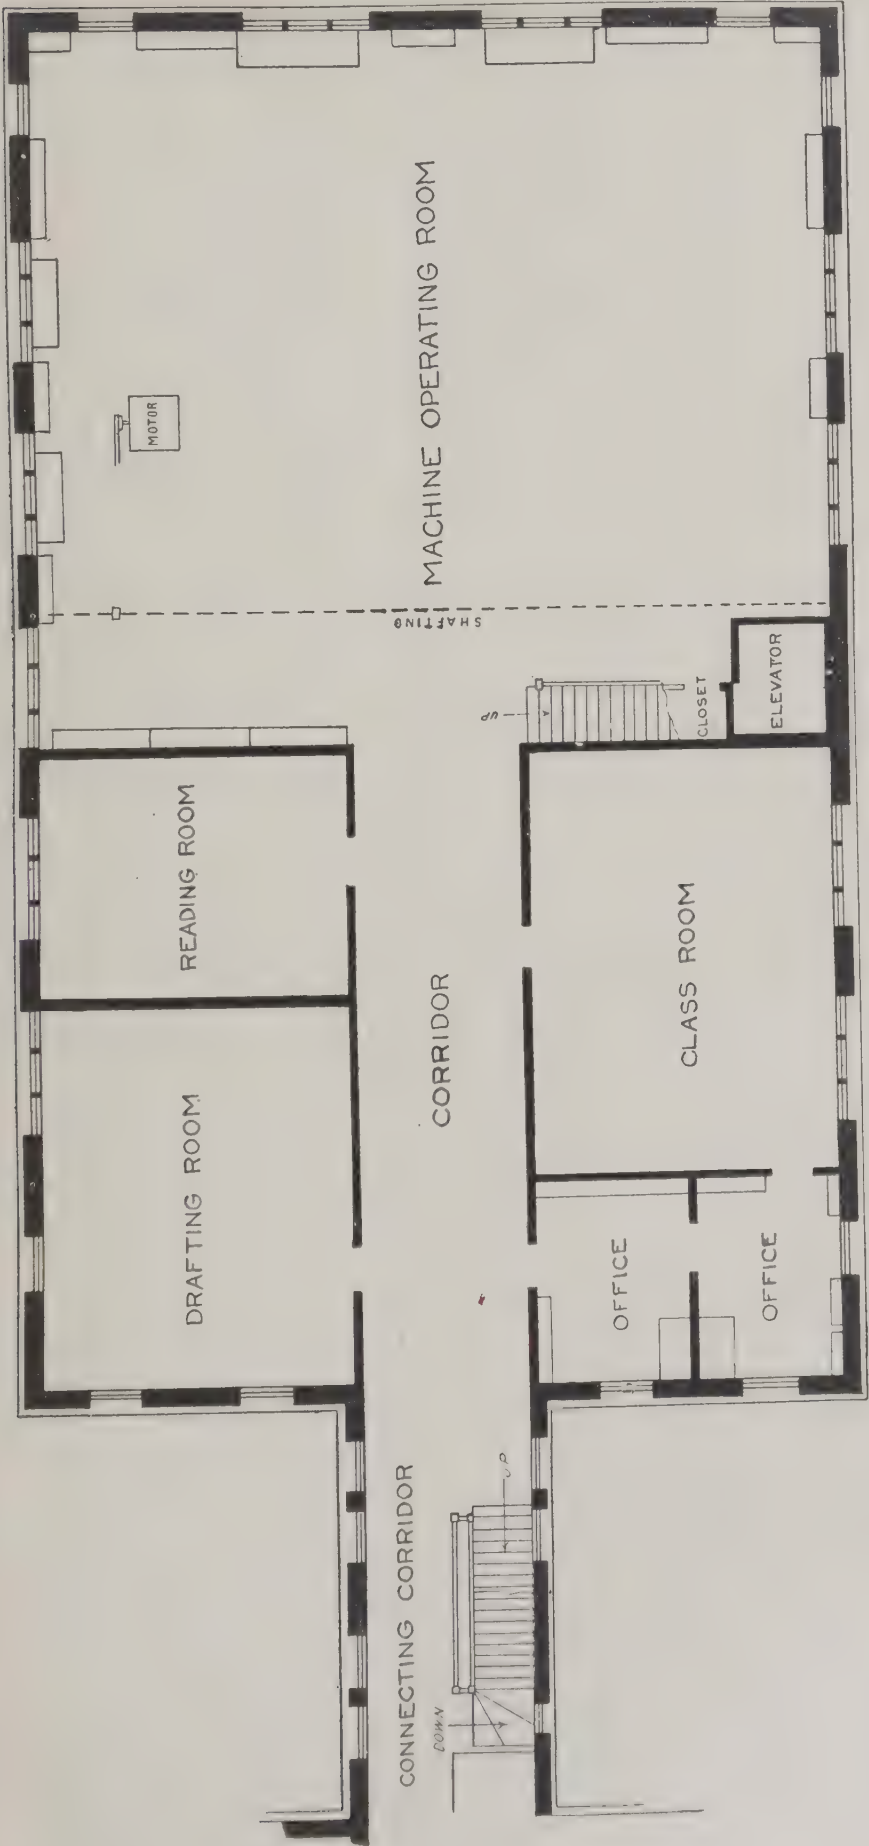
Second-floor plan of the Farm Mechanics' Building.
